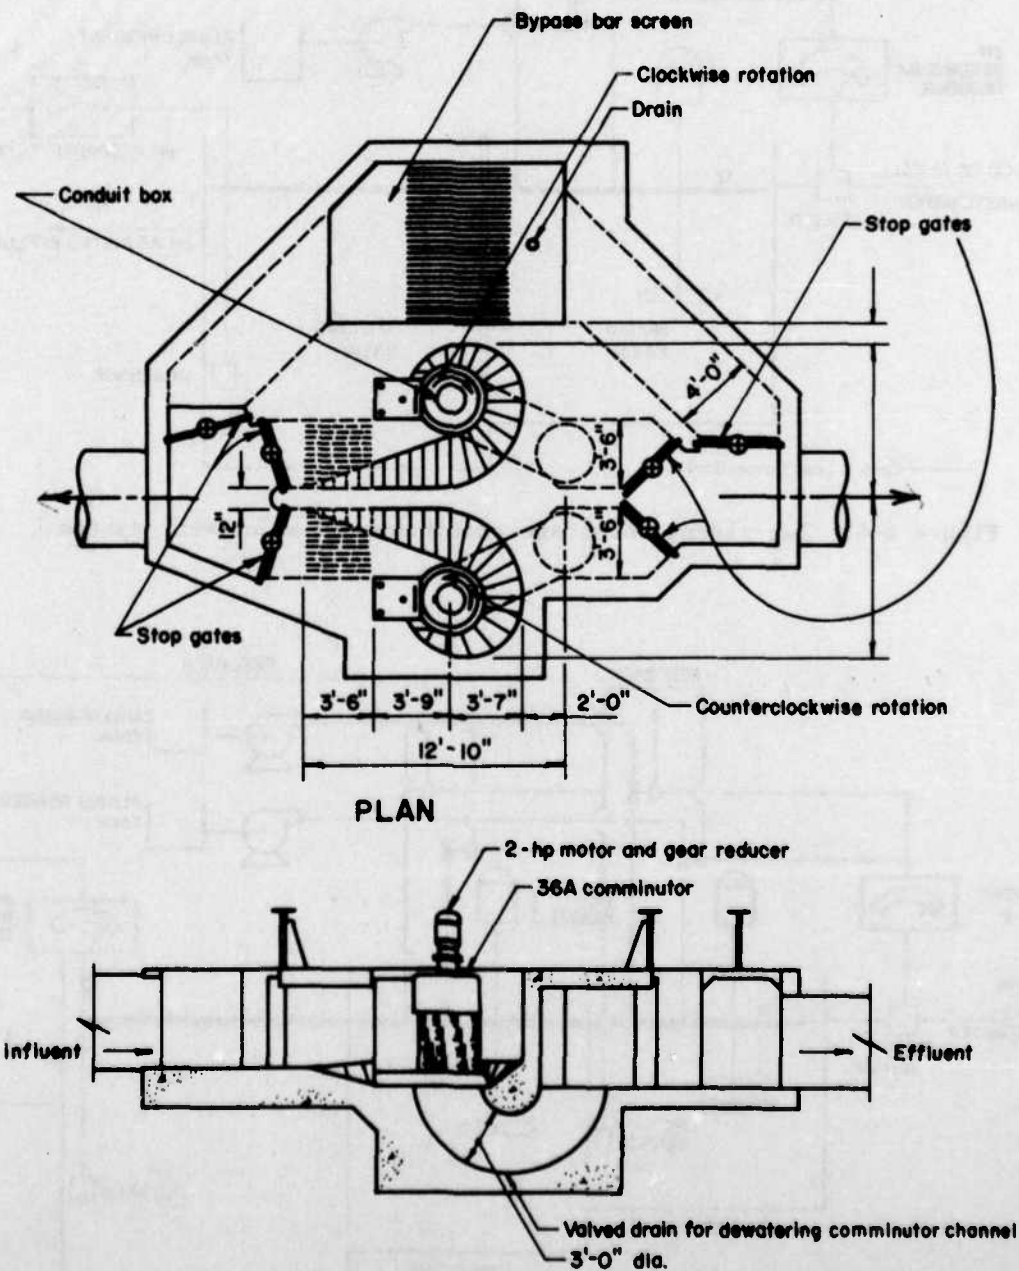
Plan and cross-sectional views of a comminutor installation.
